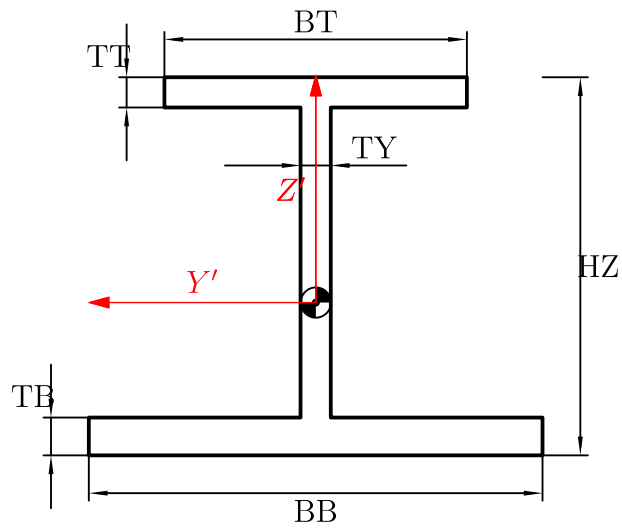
GIORH: Cross section dimensions in a Sesam GIORH profile section (used to model T sections).
